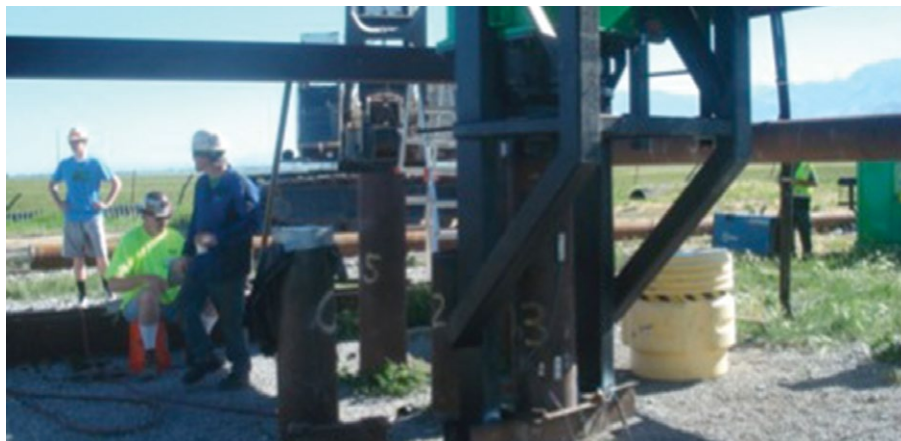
The instrumented 2003 pile under the IP3 hydraulic hammer
